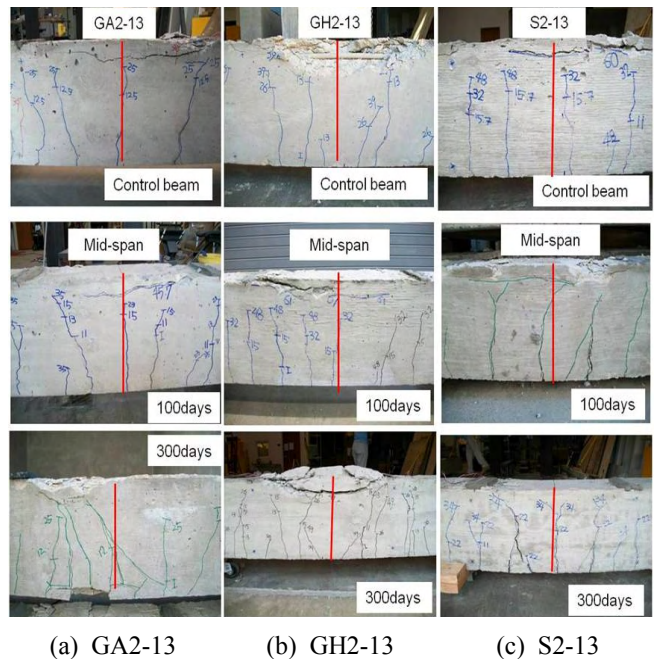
Failure modes of GFRP and steel reinforced concrete beams
